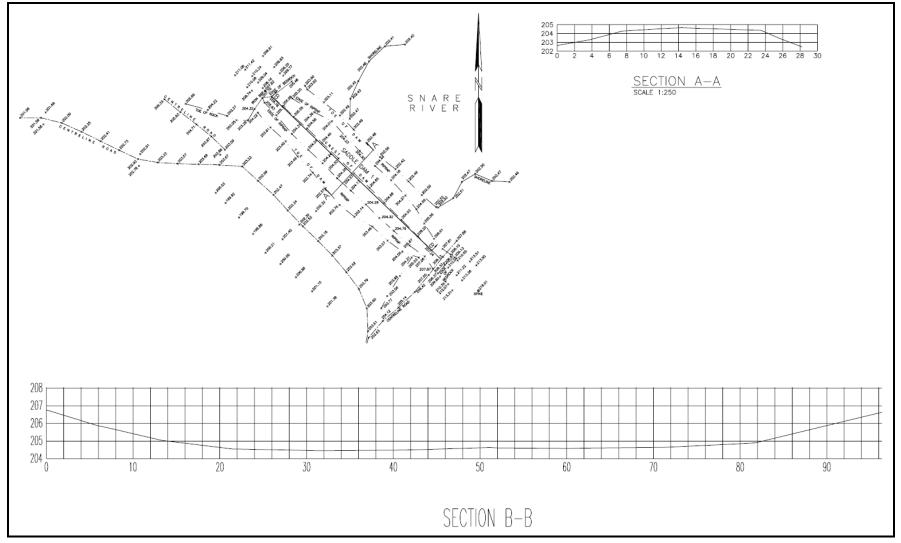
Snare Falls, Saddle Dam No. 1 – Crest Improvement Survey
